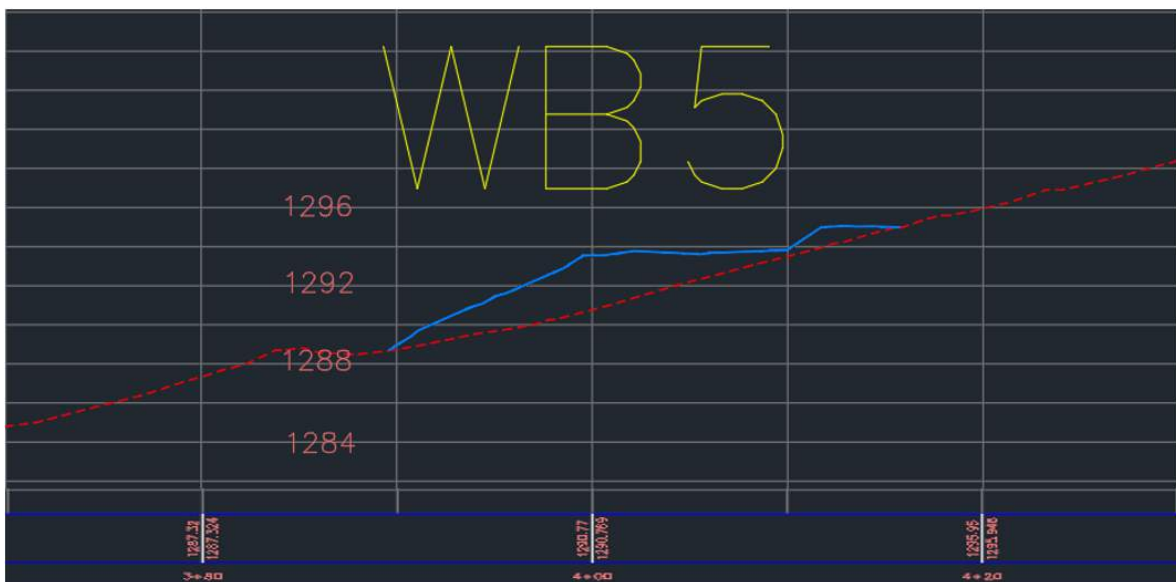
Location 5 Profile View of Existing and Proposed Ground Elevation
